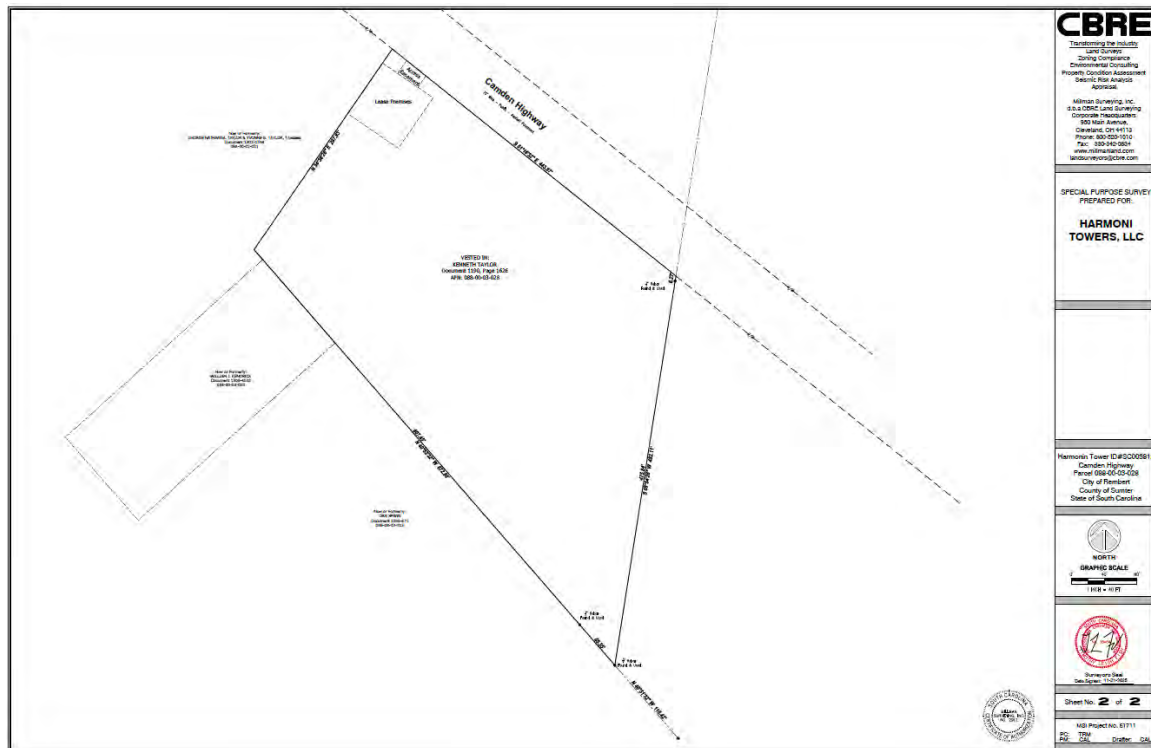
Property boundary with proposed tower lease area identified in the northwest corner
